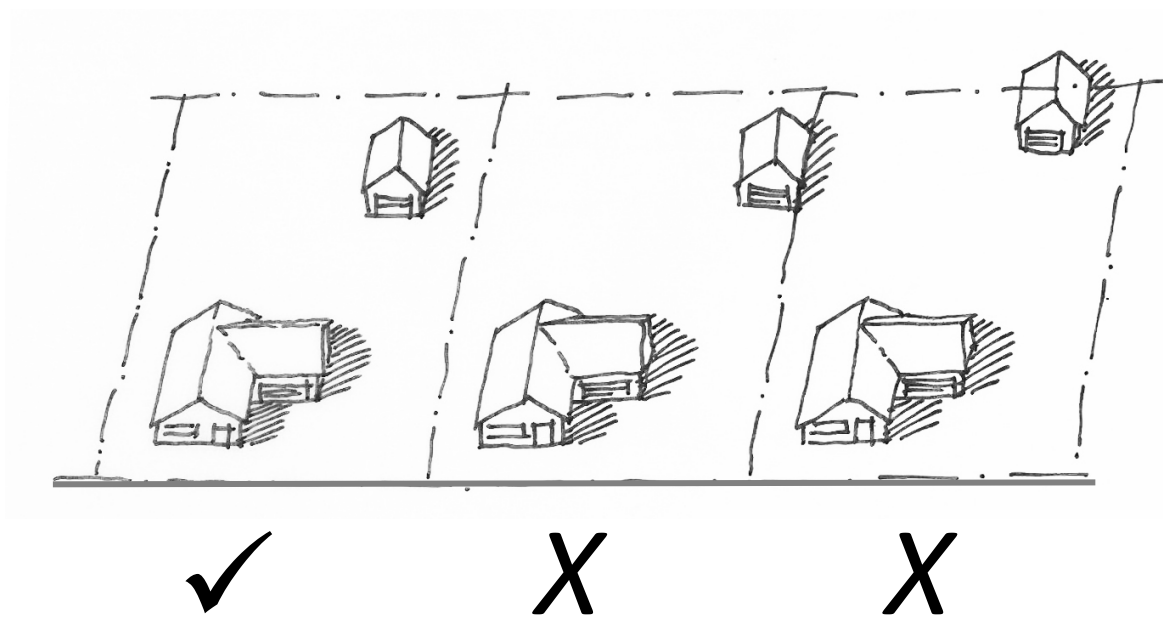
Outbuildings should not be built on the side boundary if there is a existing dwelling on the adjacent side boundary. This creates unnecessary visual intrusion at the front setback and may impact on the amenity of neighbouring dwellings
